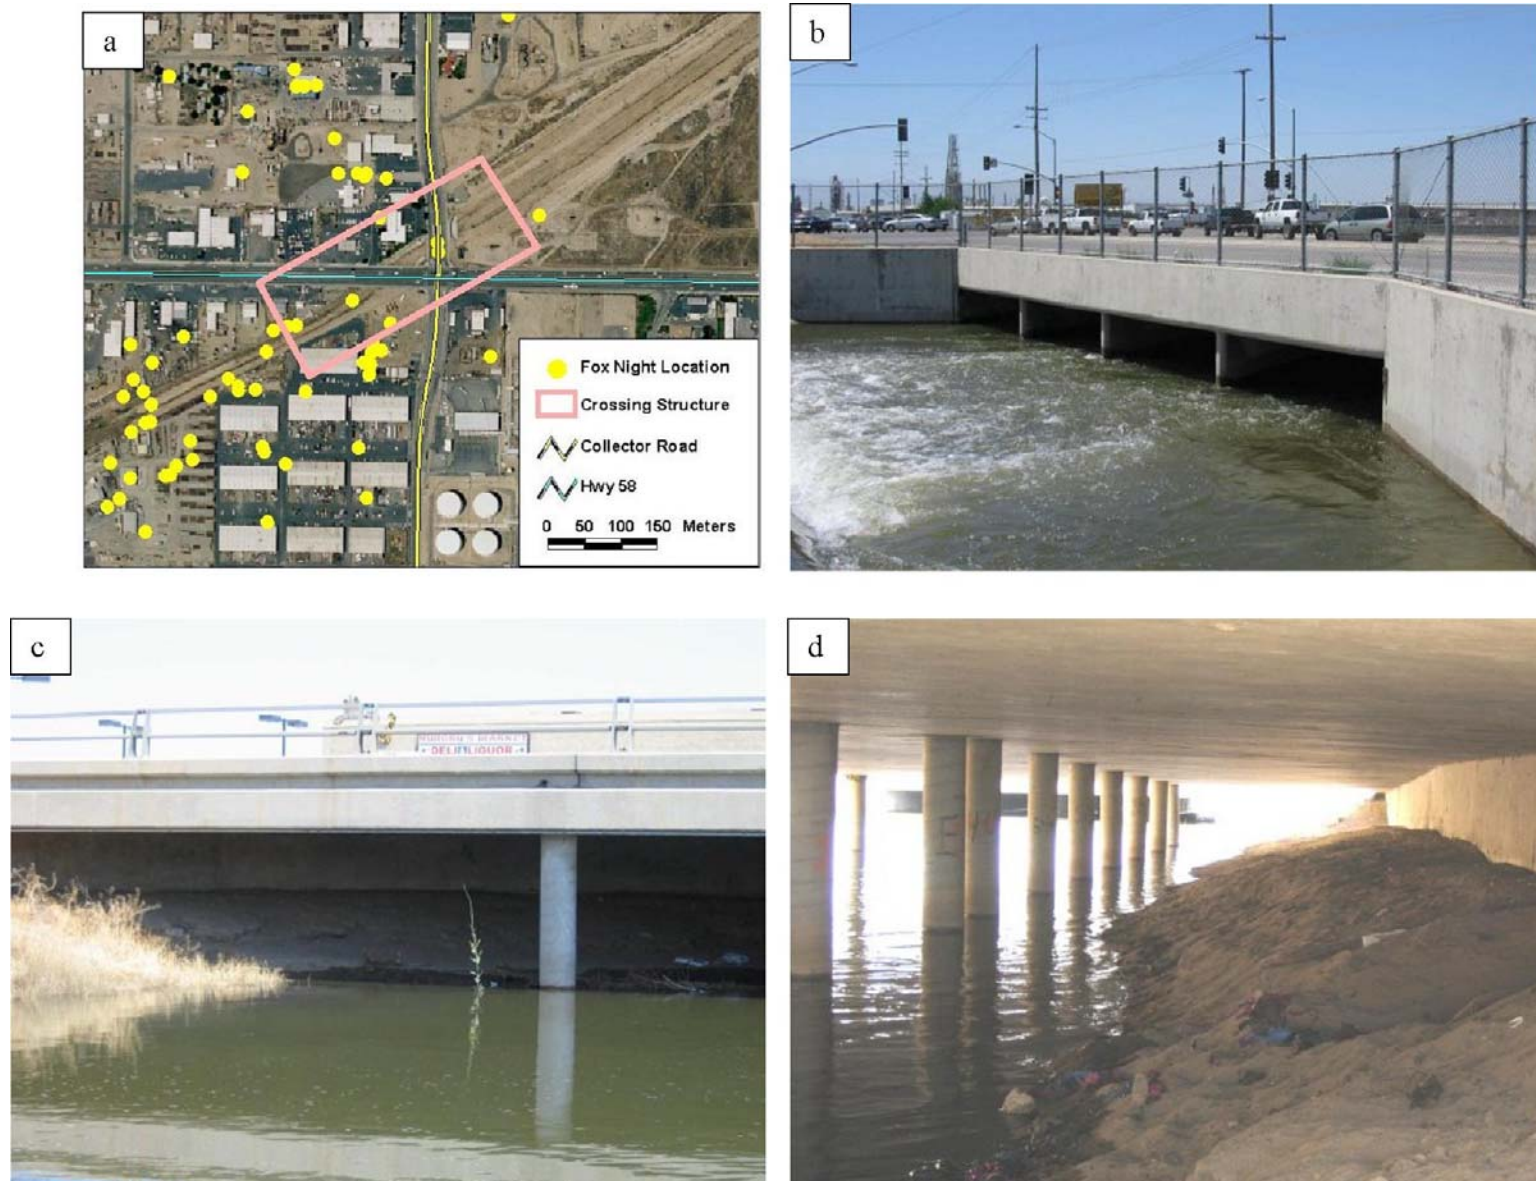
Highway 58/Fruitvale Avenue canal bridge, Bakersfield, CA. a) Aerial view of radio-tagged kit fox night locations at crossing structure. b) East entrance to Fruitvale Bridge obstructed by water. c) South entrance to highway 58 bridge. d) Dirt embankment under Highway 58 Bridge.
